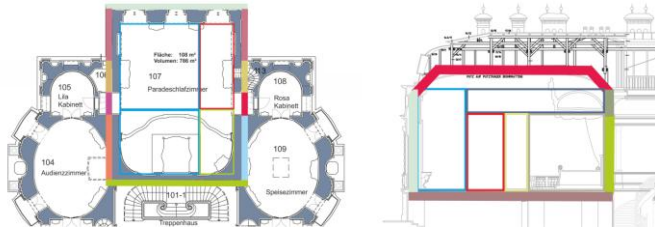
Upper floor plan with a sketch of the simplified room model of the King's Bedchamber with different wall partitions and their referred climate. The rectangle areas show rooms below in the ground floor with their arrangement in the building simulation. The right picture shows the model in cross-section lengthwise with referred building assembly and adjacent climate zones. (Plan Material: BSV)
